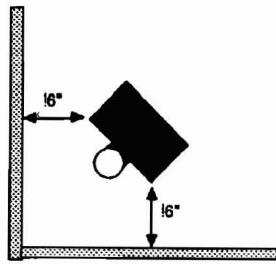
B. Clearances to unprotected walls when using Jøtul heat shield, part 950076, and Type E double wall air insulated chimney connector.
